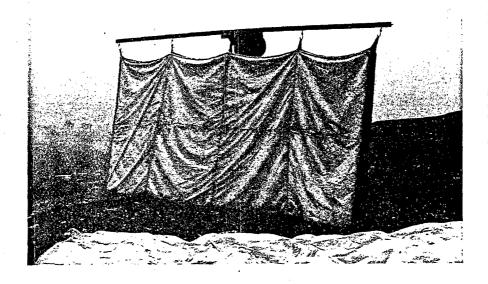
Lifting bar, attached to excavator bucket, being used to place 48 by 50 ft (14.6 by 15.3 m) Airspace Saver panel. (Can also be used to place COVERTECH C-440 panels.)
